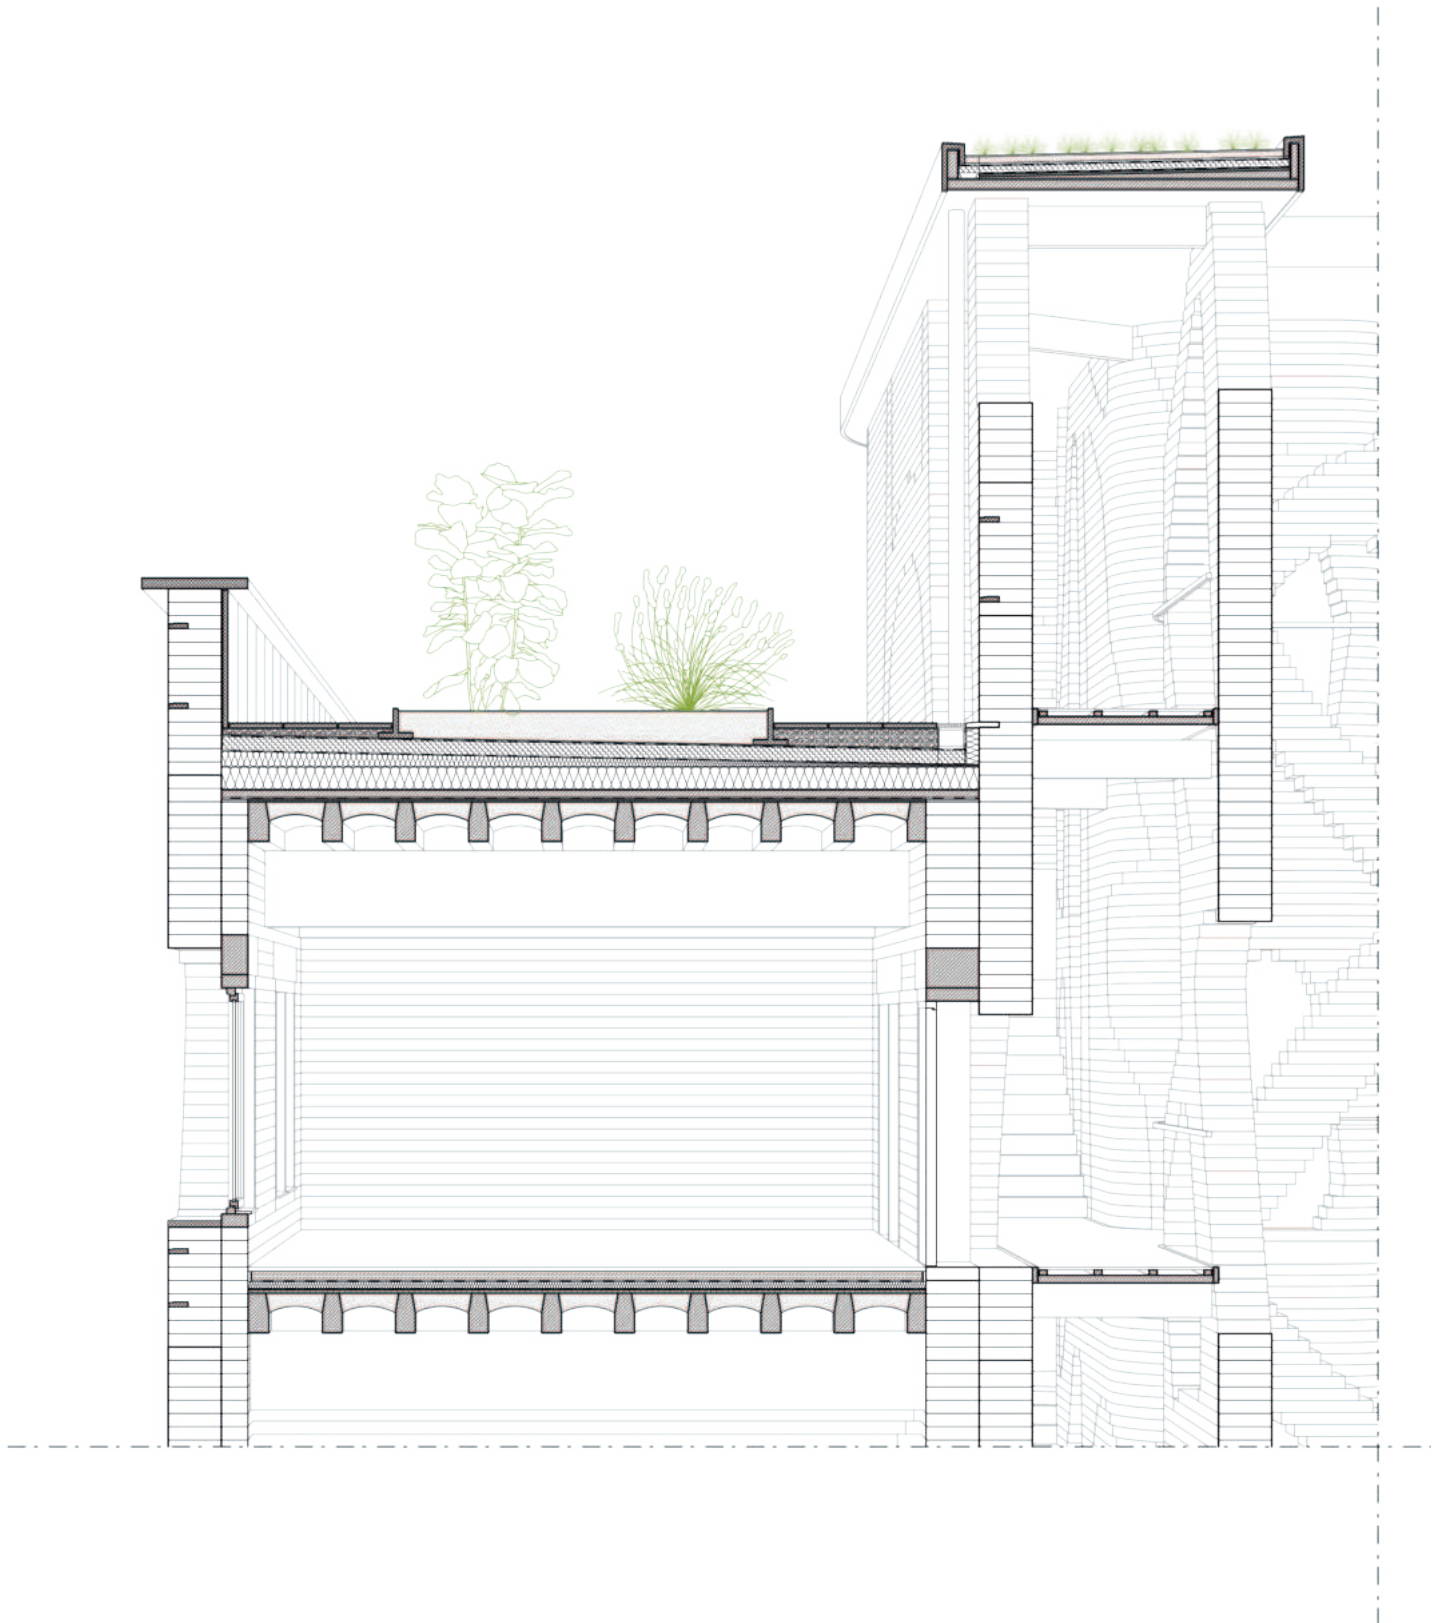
/ Left side / Perspective detail section of core, roof and regular level
